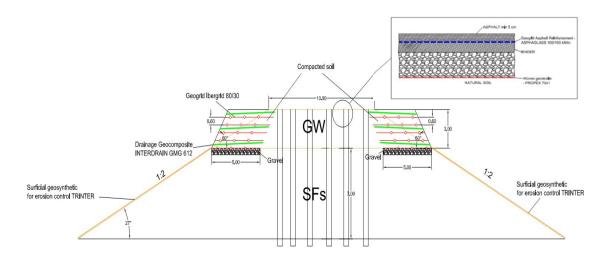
Cross section of abutment S-1 with geogrids and jet grouting columns (RS2)
